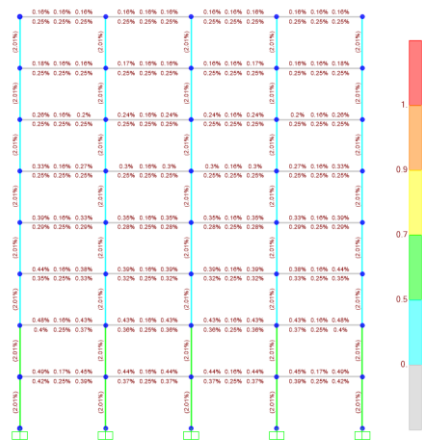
Structure's columns & beams max. percentage of longitudinal reinforcement (axis-2) in zone III
